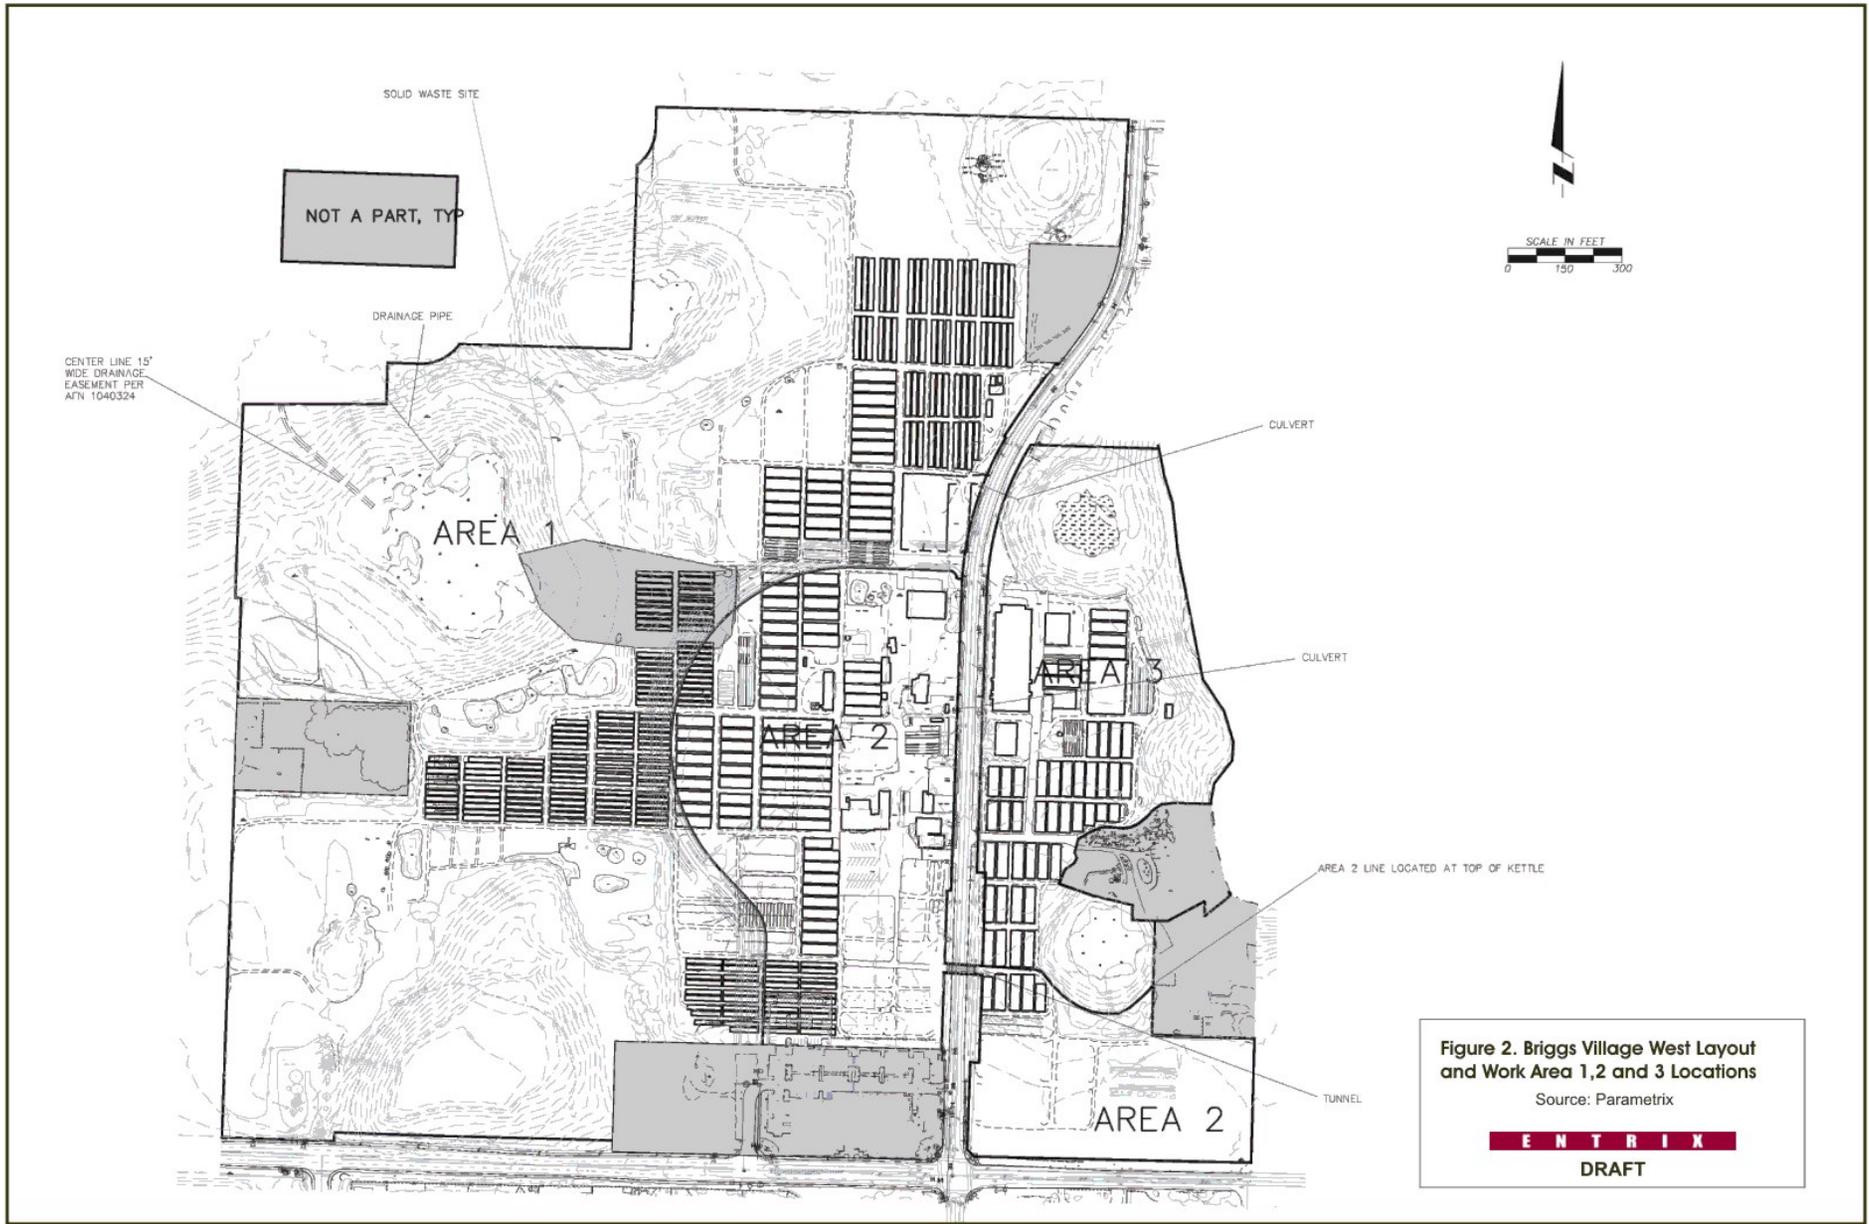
Briggs Village West Layout and Work Area 1,2 and 3 Locations
